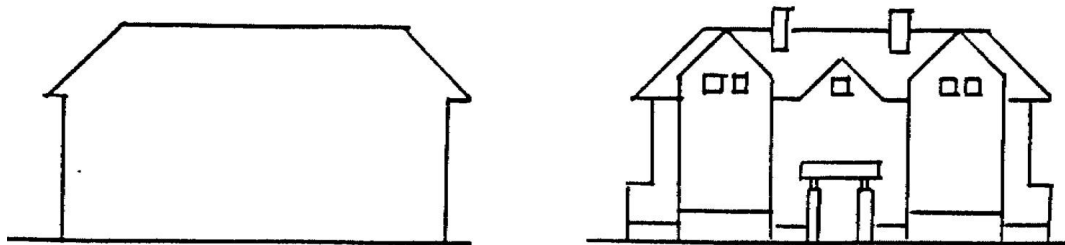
Schematic elevation sketches of two multi-storied buildings with equal heights and widths. Architectural details such as porches, windows, and roof dormers “articulate” a building’s façade (right) which enhances visual quality and contributes to a human-scaled development.
